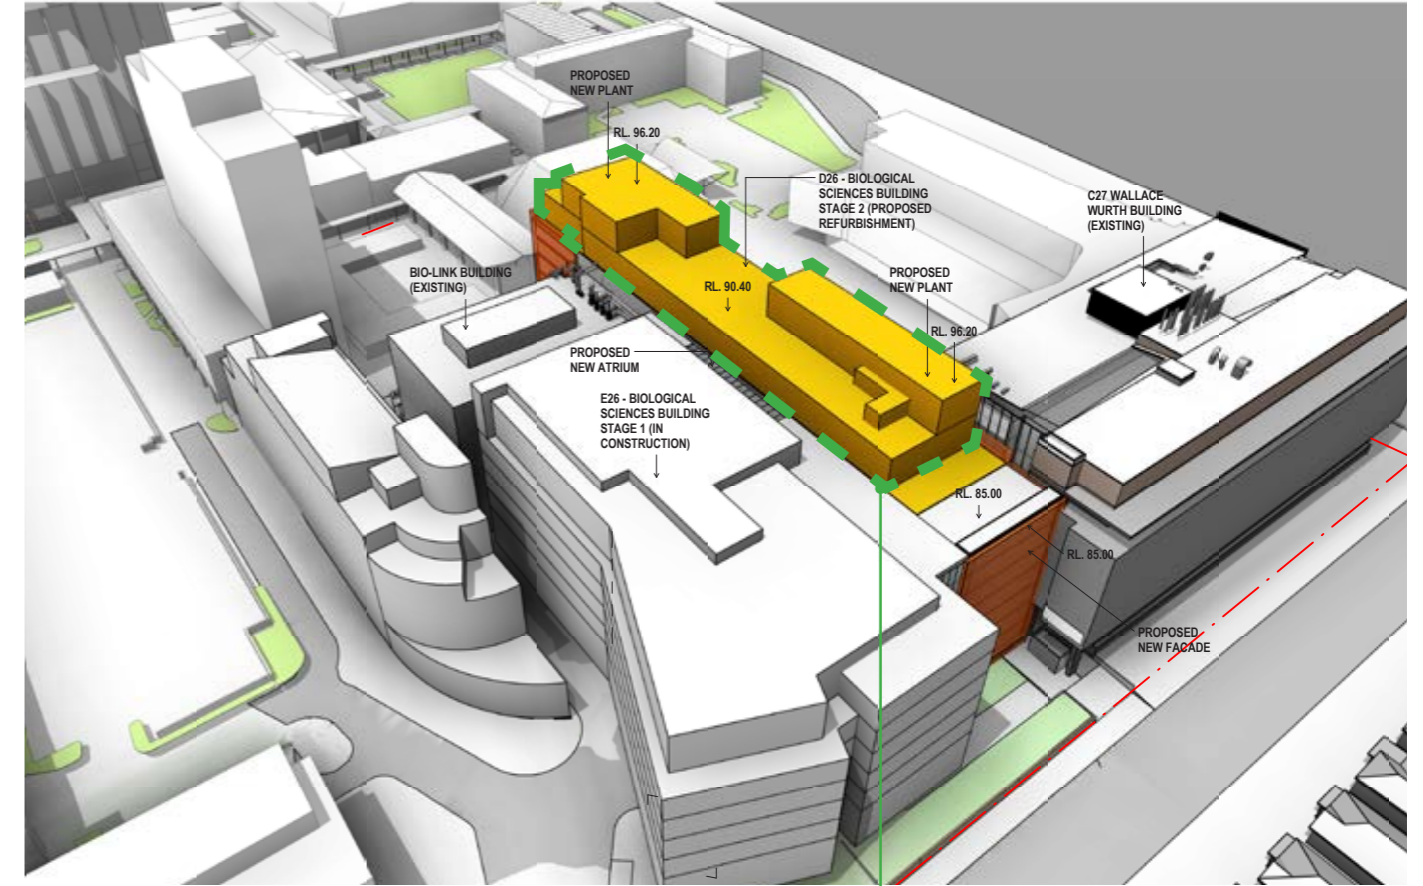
Proposed S96 Building Form (Aerial view from southeast)
